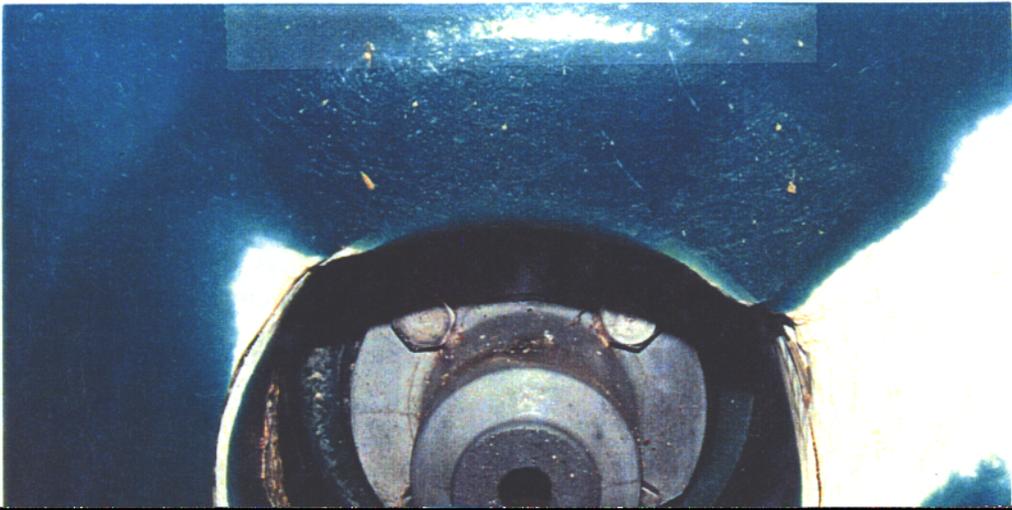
Duct Wall Damage Near a Spray Header
